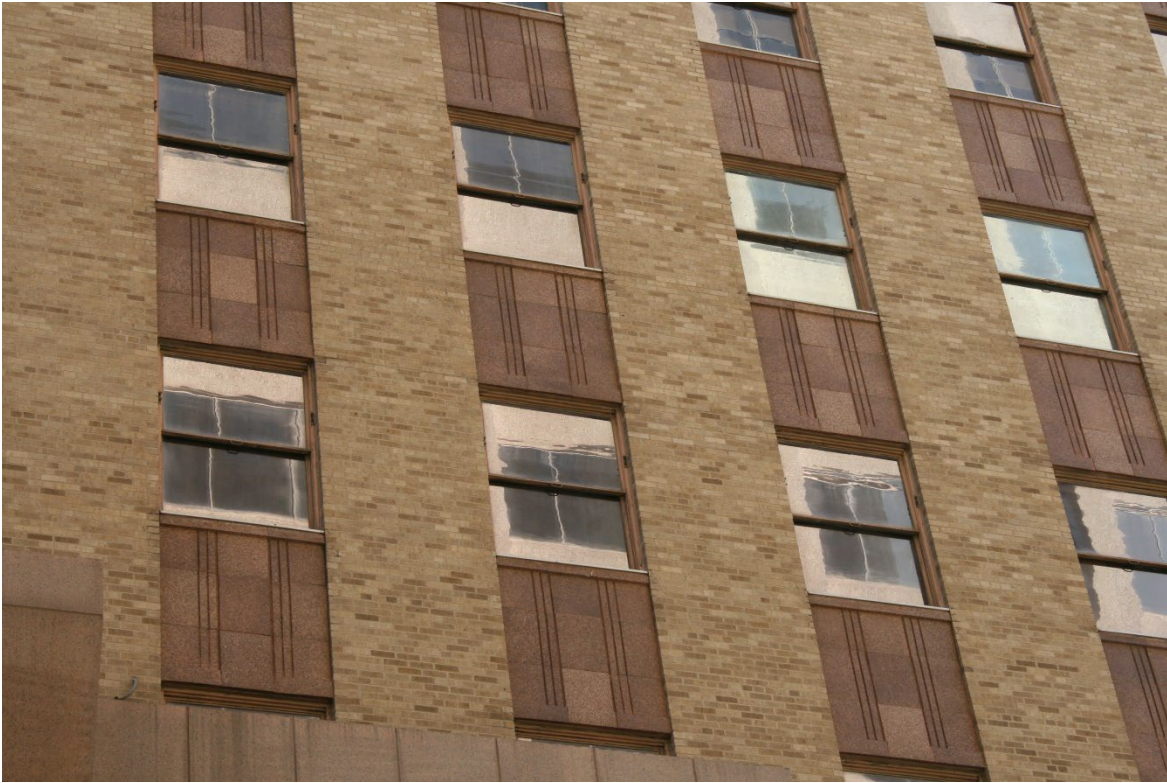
View of Original Metal Windows and Terracotta Spandrels (Provided by Applicant).
